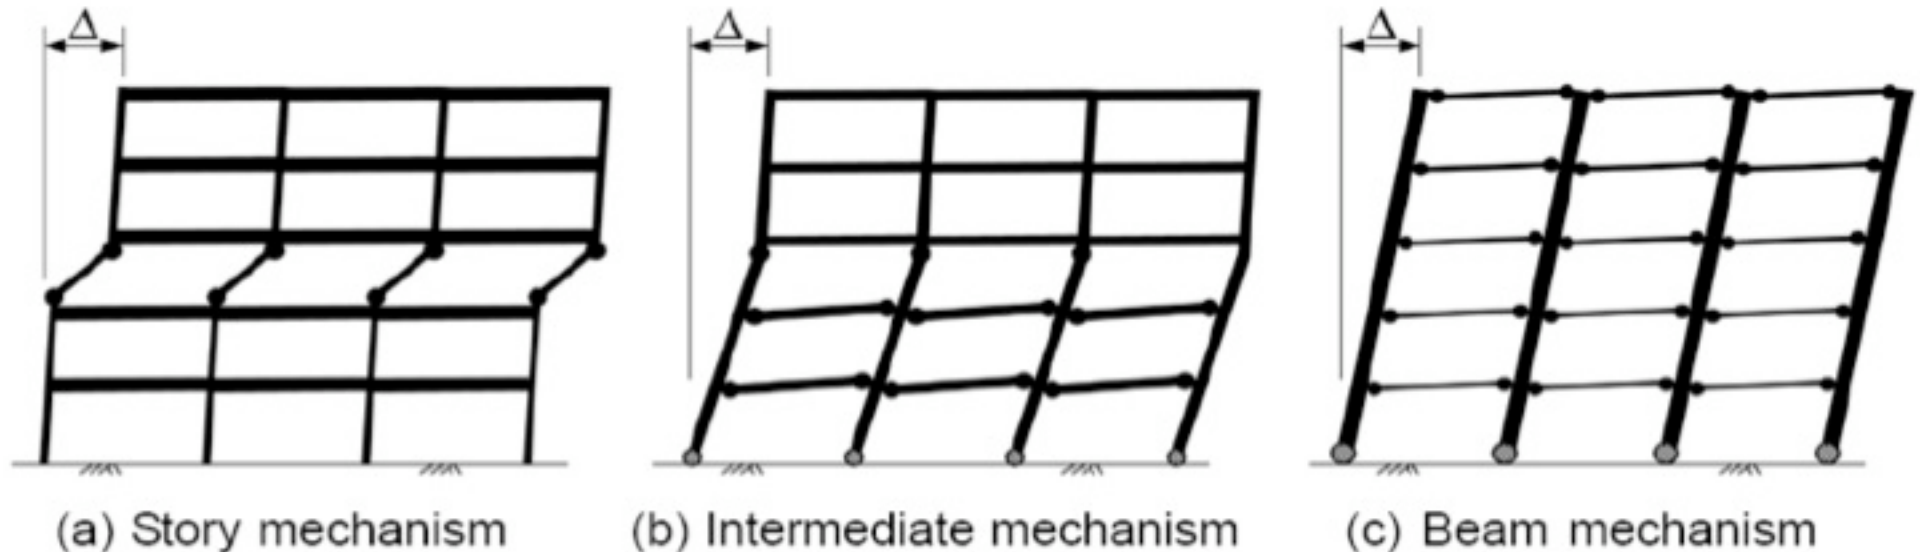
Design of special moment frames aims to avoid the story mechanism (a) and instead achieve either an intermediate mechanism (b) or a beam mechanism (c).
